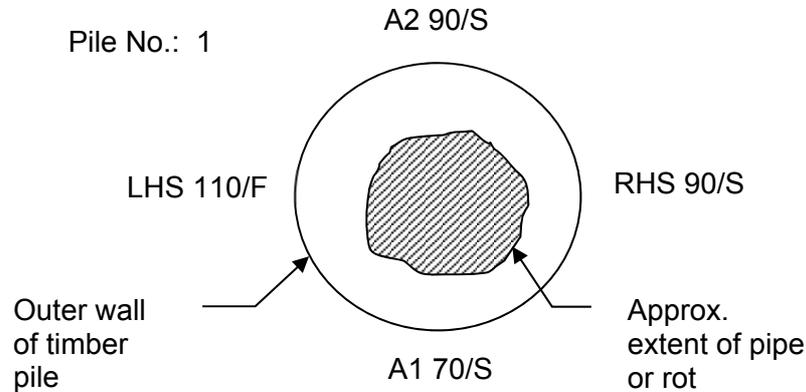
PIER PILE ROT ZONE EXAMPLE
